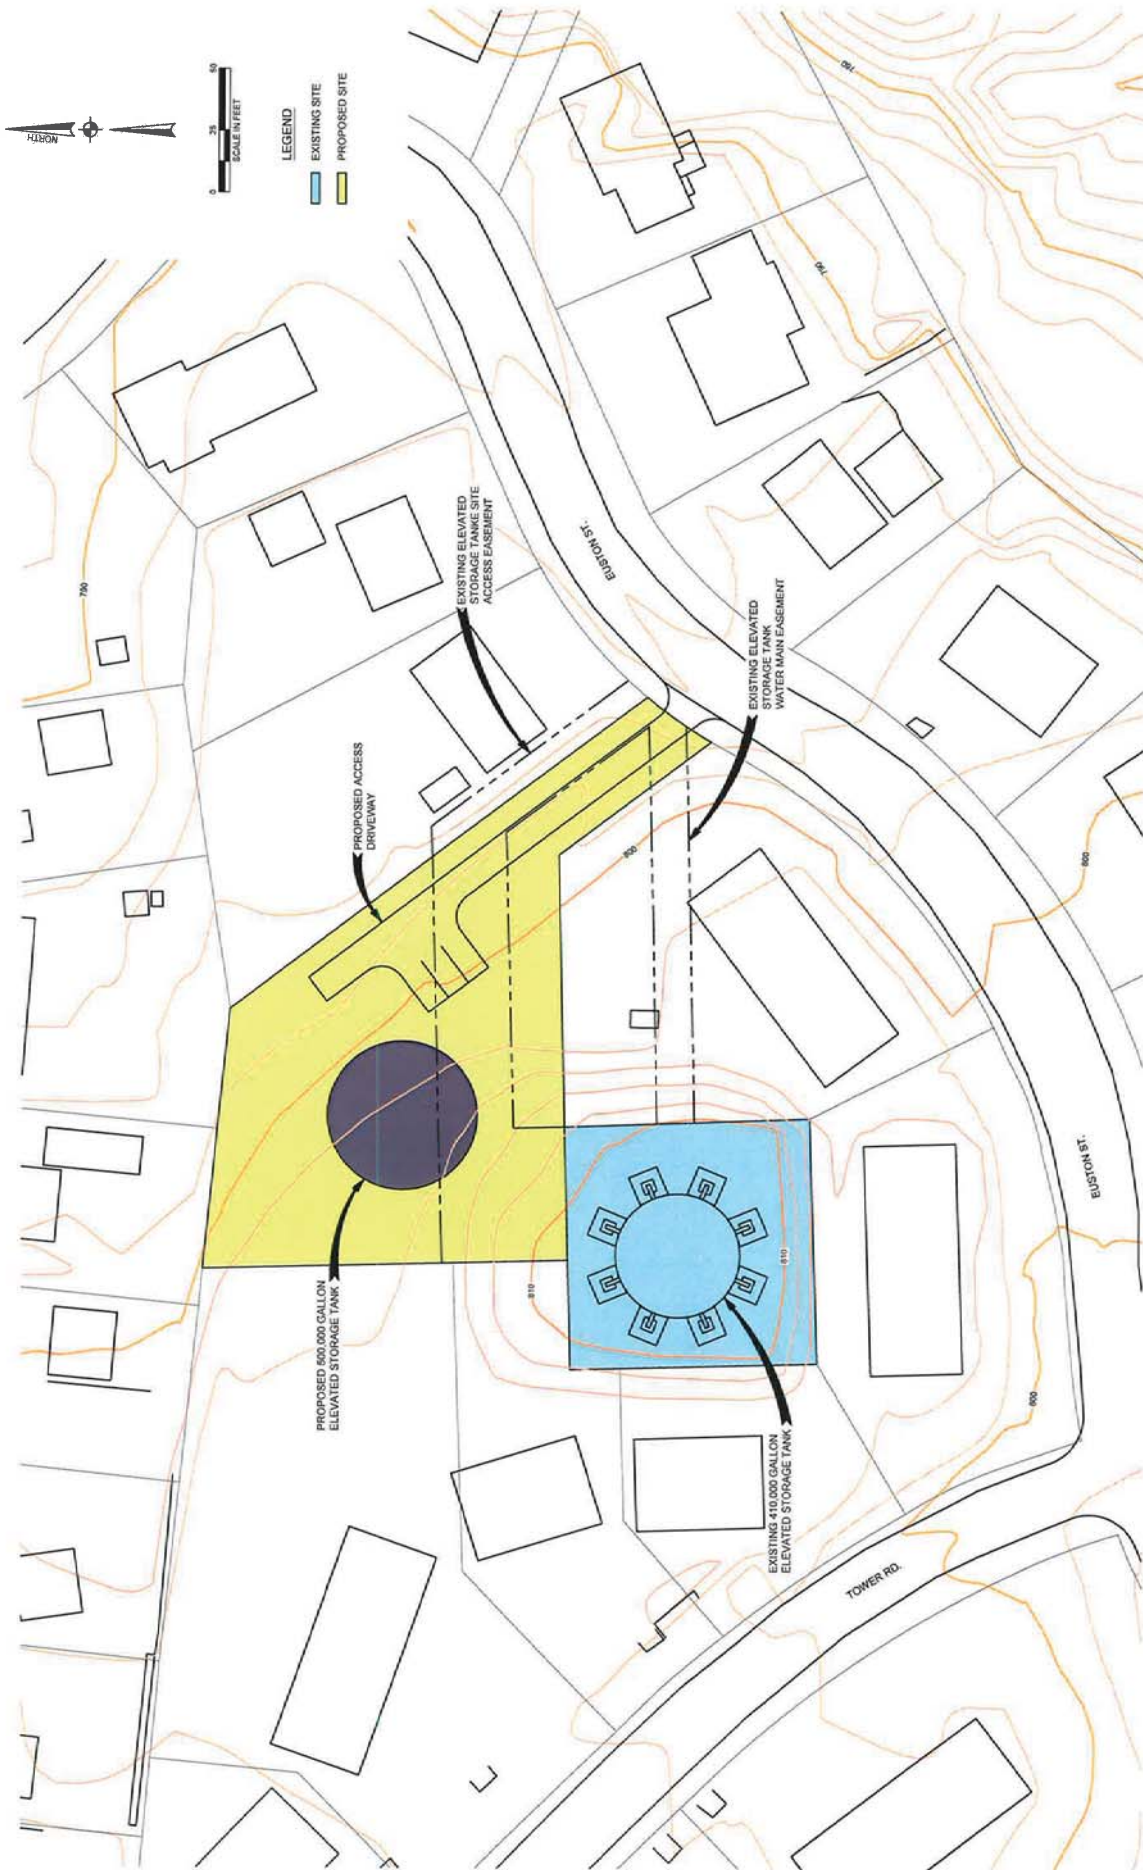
Preliminary Arrangement for a 500,000 Gallon Elevated Storage Tank at the Existing Site
